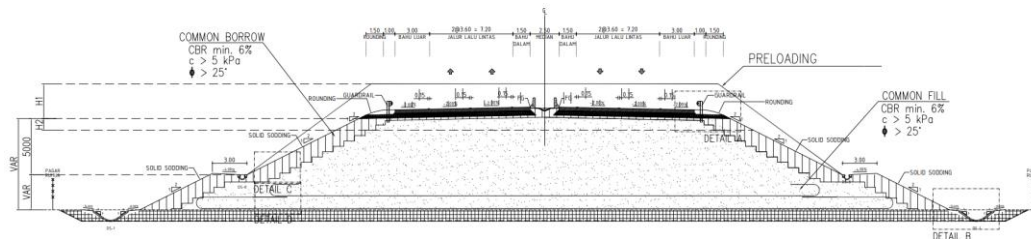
Cross section of STA 7+450 from Detail Engineering Drawing
